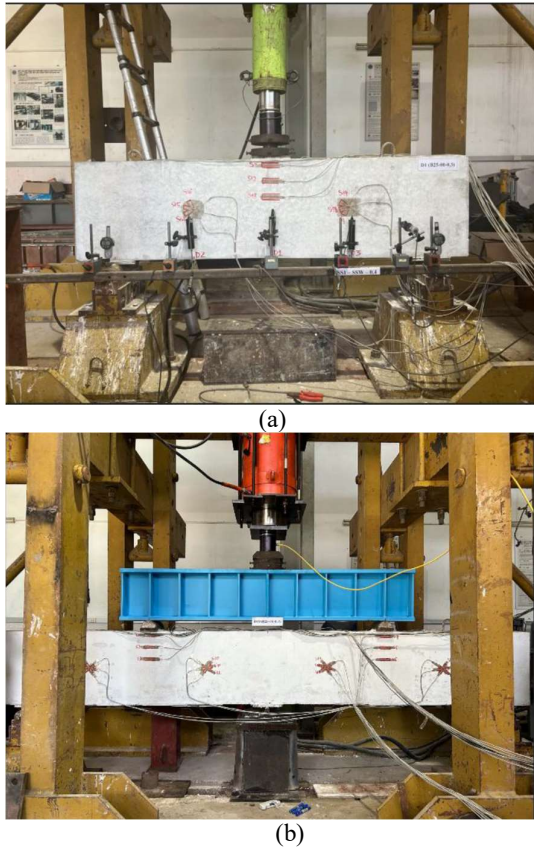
Test setup and instrumentation: (a) Simply supported beams; (b) Two-span continuous beams
